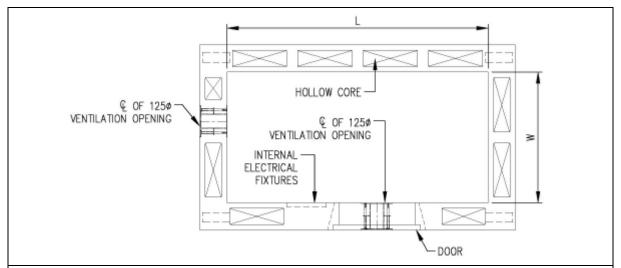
E – Precast HS With HS Door On Longer Wall And One Of Ventilation Sleeves Above The Door
